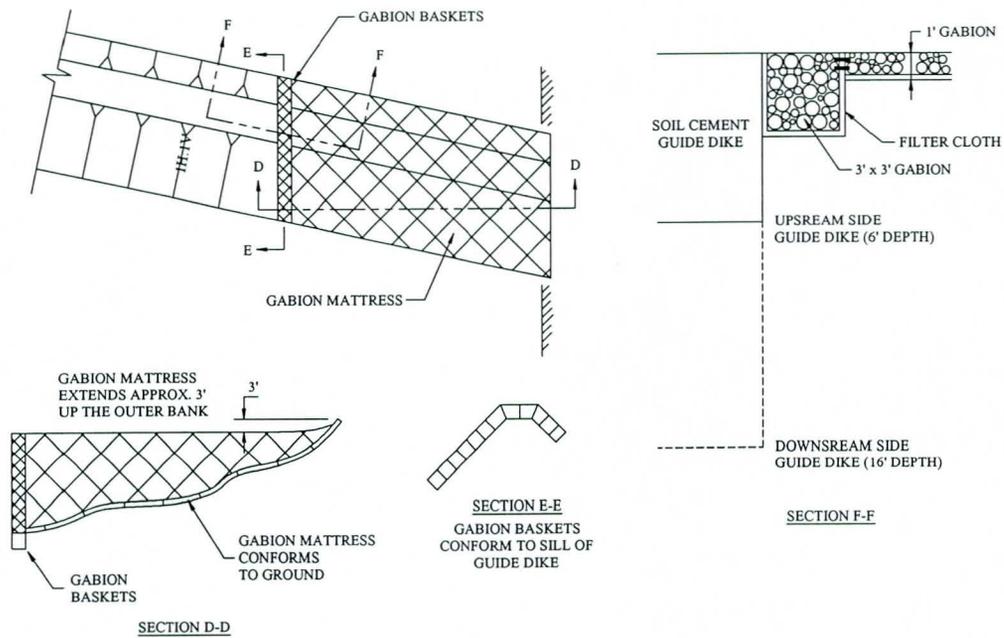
Plan view of revised guide dike design, end detail for transition from soil cement to gabions near outer bank.
